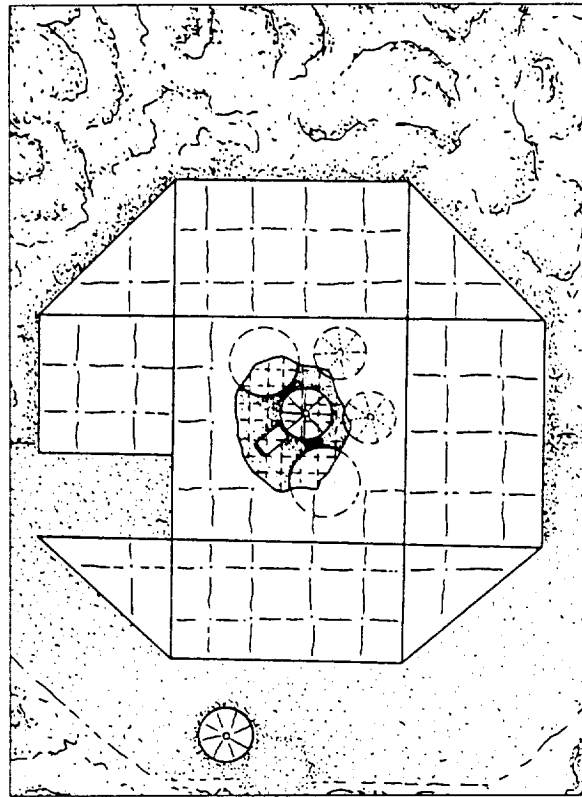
Dedicated greenhouse facilities will be placed underneath the shelter system.
